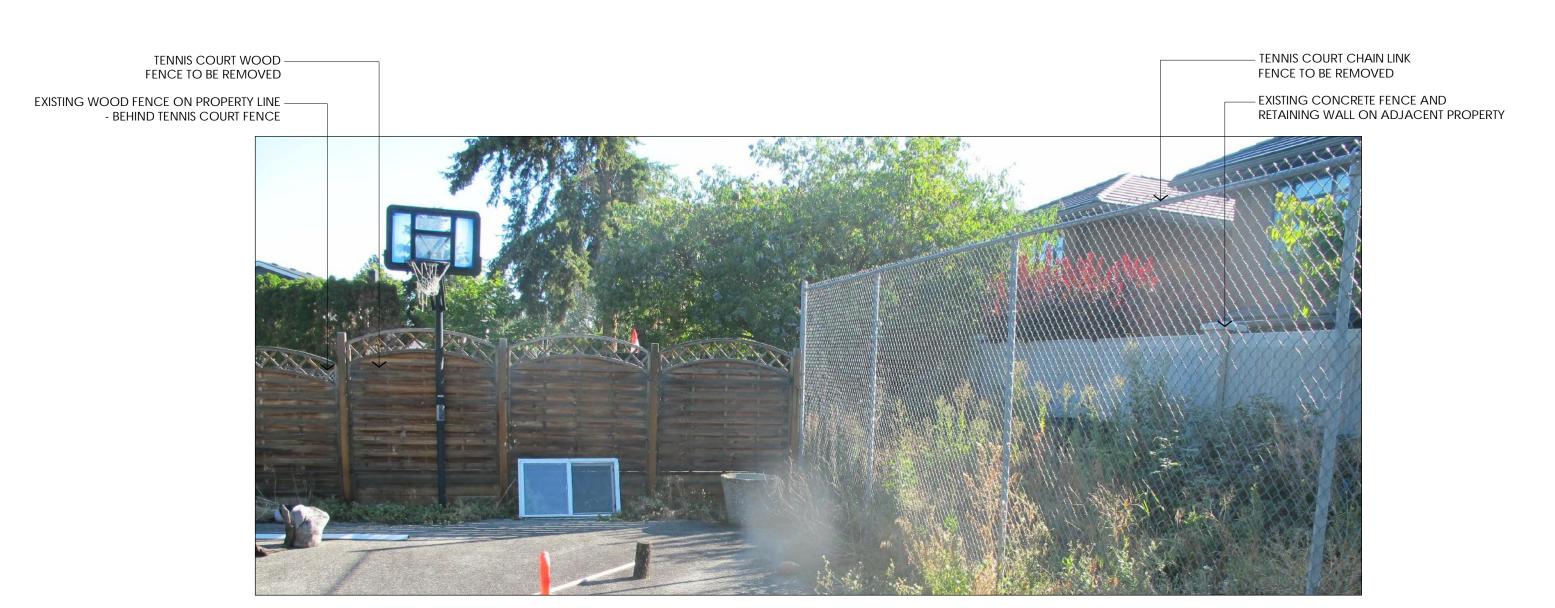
PHOTO - EXISTING CONDITIONS - SOUTH ELEVATION
